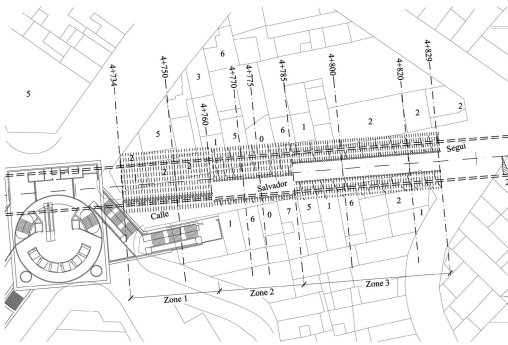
Ground movement control by means of jet grout columns. Plan view.
